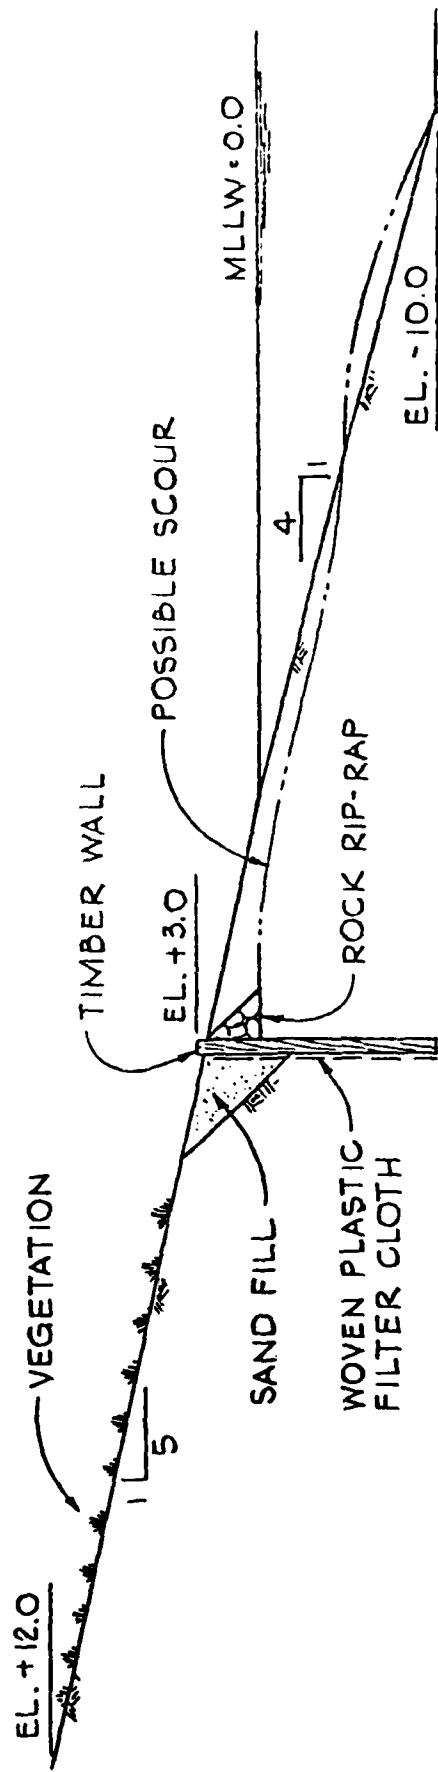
TIMBER WALL - INTERIOR CHANNELS
